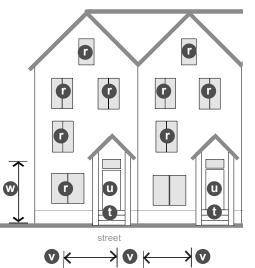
(4). Townhouse Building: Street Facade Requirements
